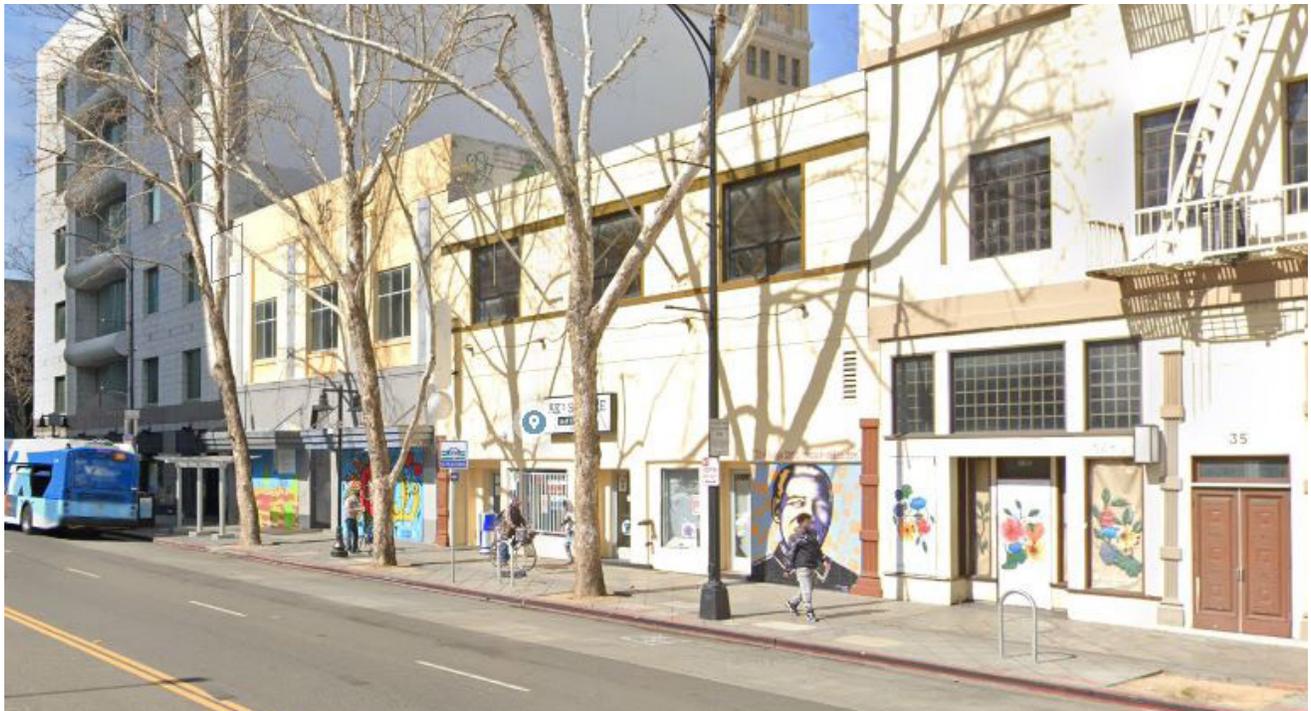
West facing view of the existing buildings at 17 and 29 E. Santa Clara Street.
